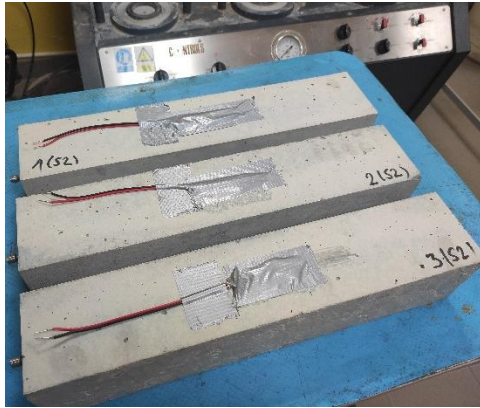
Concrete samples prepared for shrinkage testing - mix R
